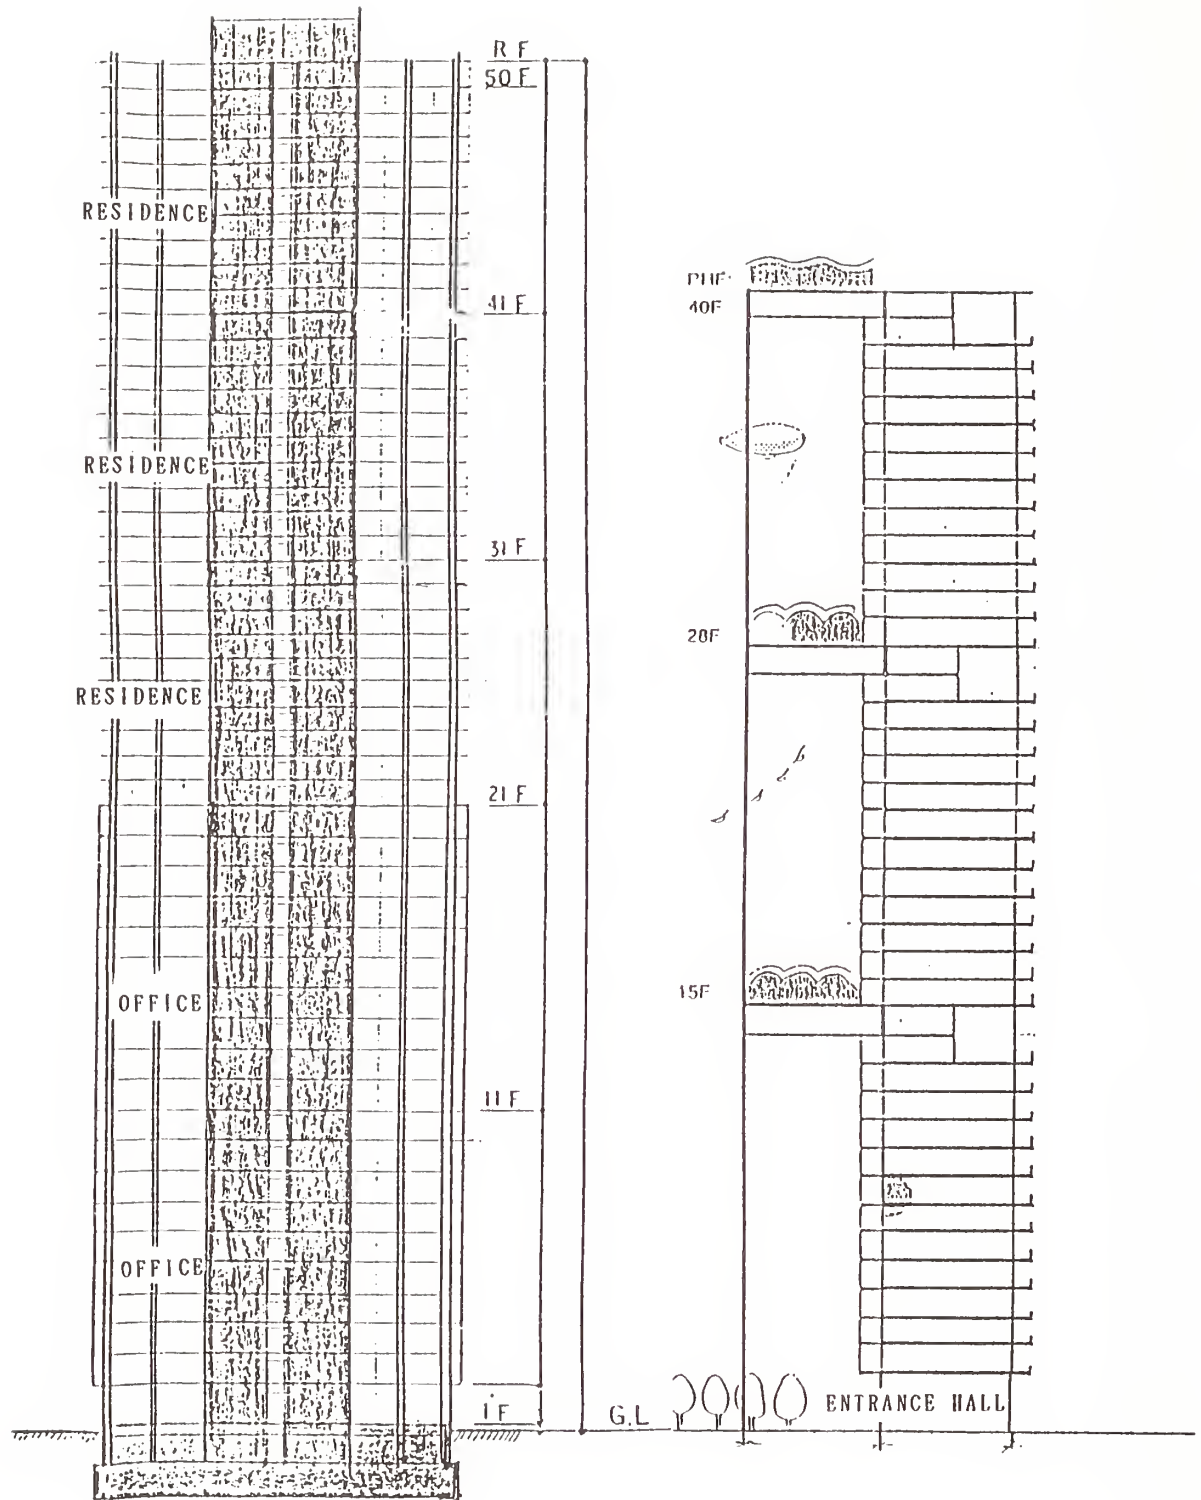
1 (b) Section of core wall type Fig. 5. 2 (b) Section of wall type
